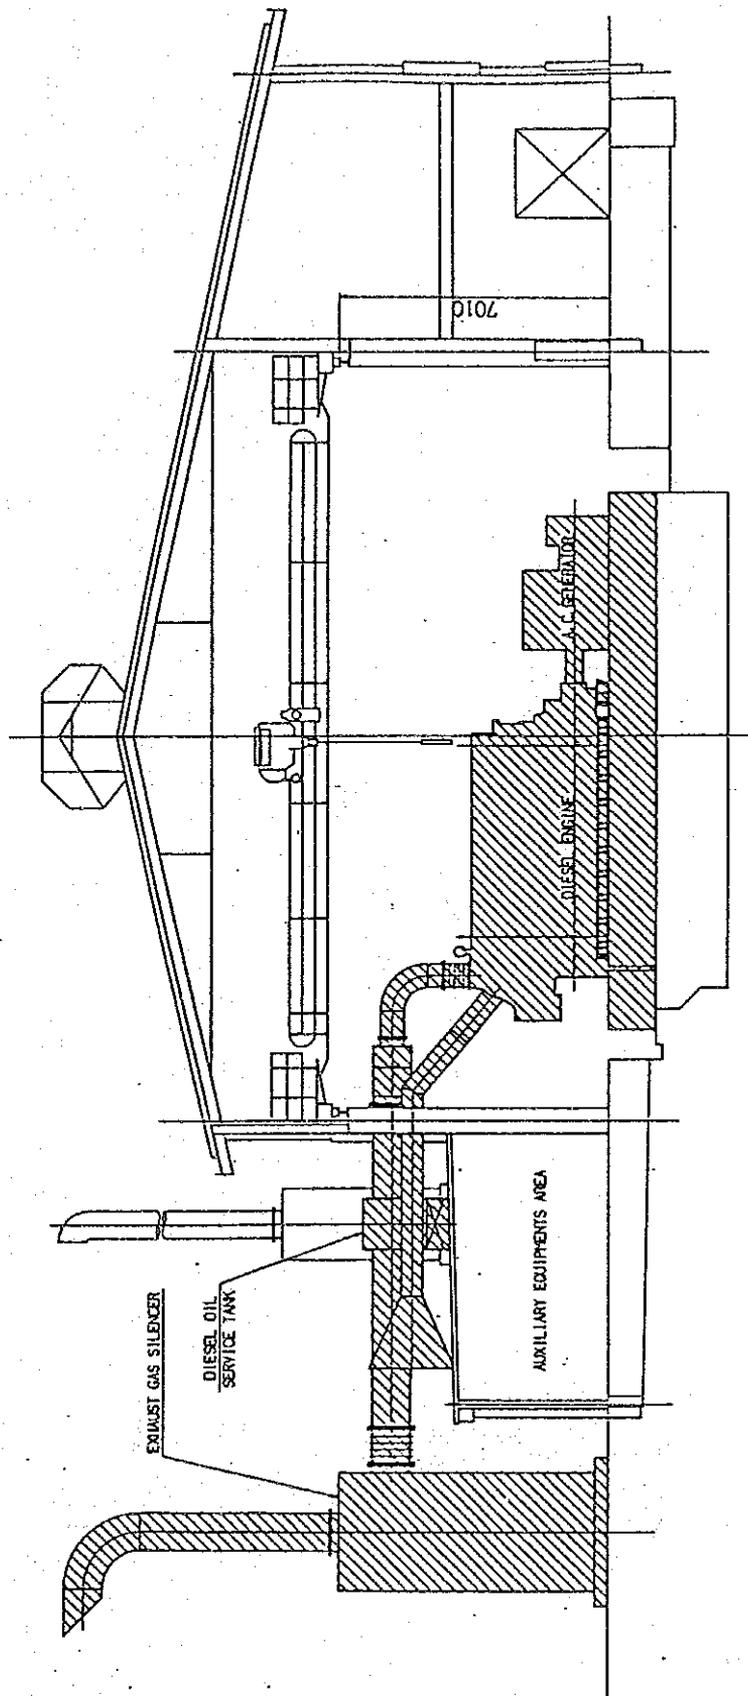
POWER HOUSE LAYOUT (PLAN)
